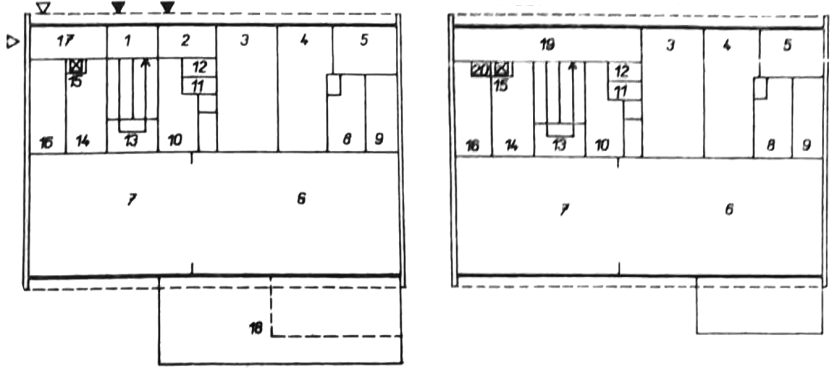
| Example of a Kindergarten Pavilion Layout (Výstavba školských zařízení, 1973)
